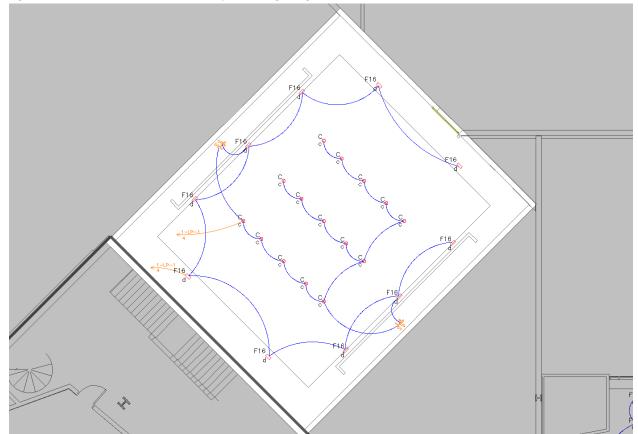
Rehearsal Room – Balcony Level Lighting Plan
